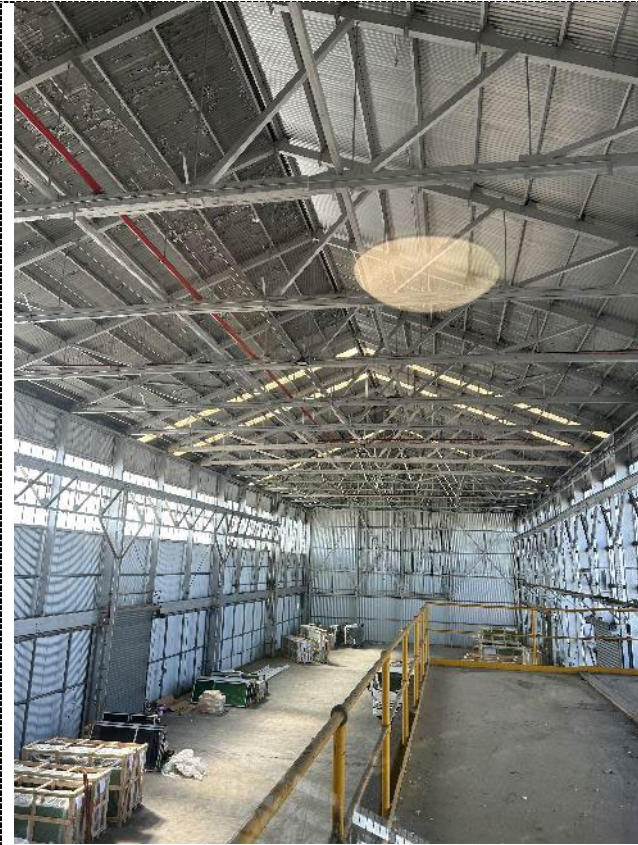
Southern warehouse, taken from the upper offices. The timber trusses have been painted silver.
